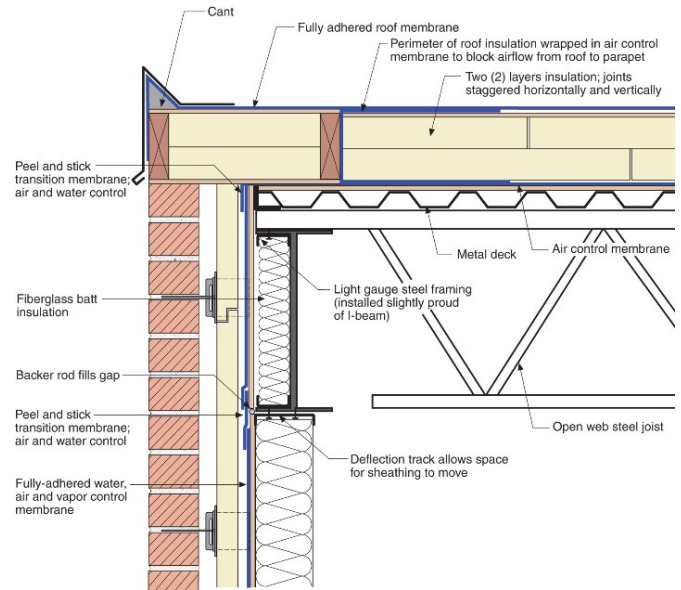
The Cantilevered Mini Parapet: Notice that air control layer continuity is achieved by wrapping the membrane over the building corner and then constructing the cantilevered portion of the parapet over the top of this air seal.
